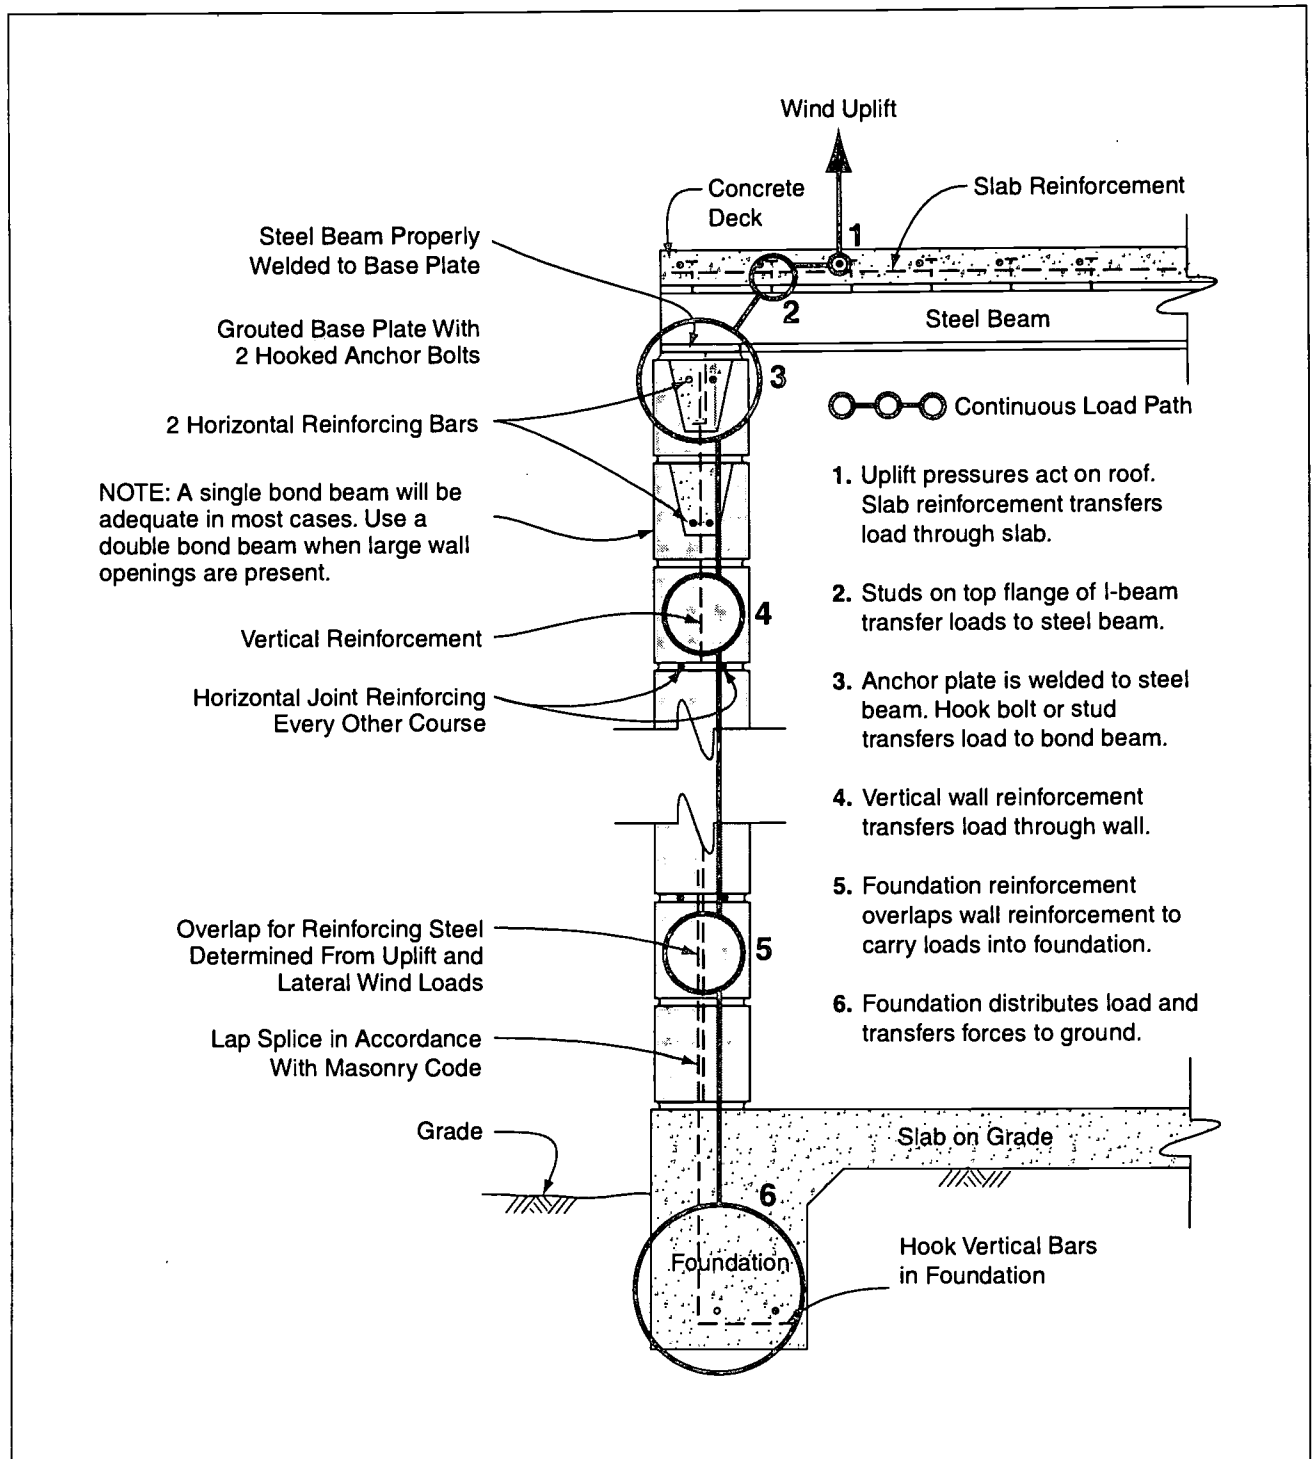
Continuous load path in a reinforced masonry building with a concrete roof deck.
